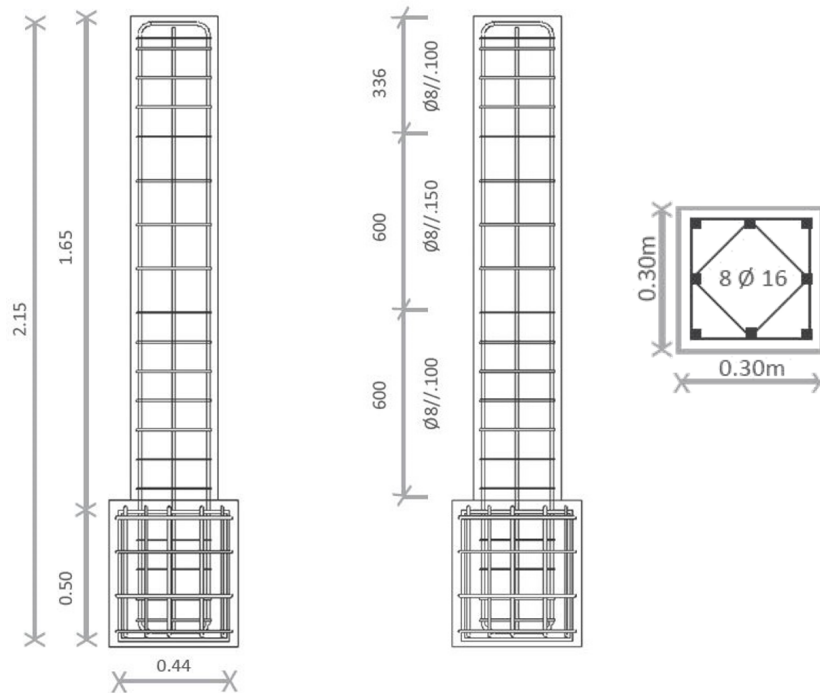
RC cantilever column (carbon steel): Specimen dimensions (left), shear reinforcement details (center) and cross-section of the specimen (right).
